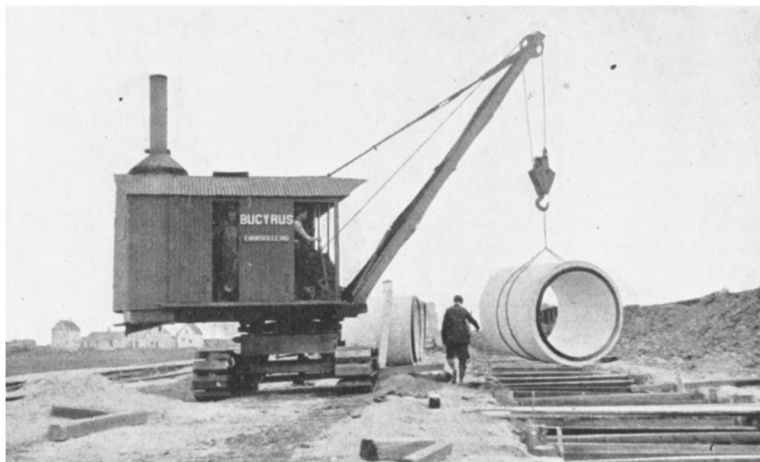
LOWERING AN 8-FOOT LENGTH OF 66-INCH LOCK JOINT PIPE INTO THE TRENCH
